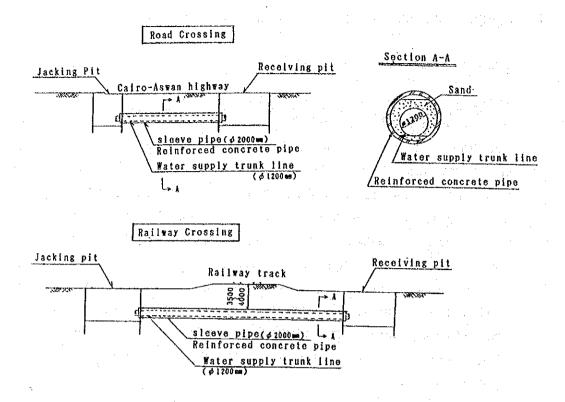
Sleeve Pipe Jacking Method for Trunk Road and Railway Crossing Sections
